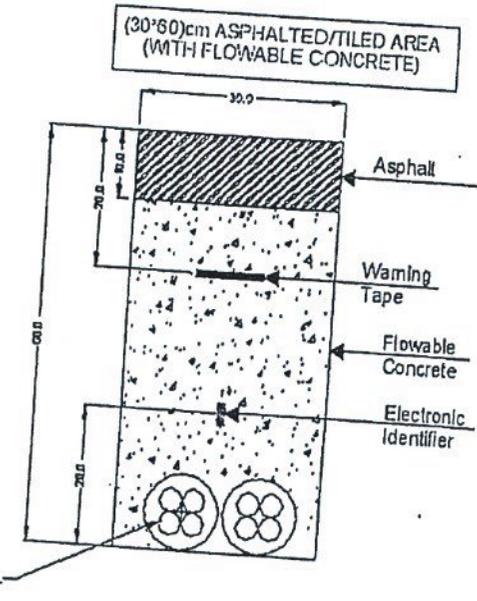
Installation of Ducts in Manholes B, C, D, E, F, and G
